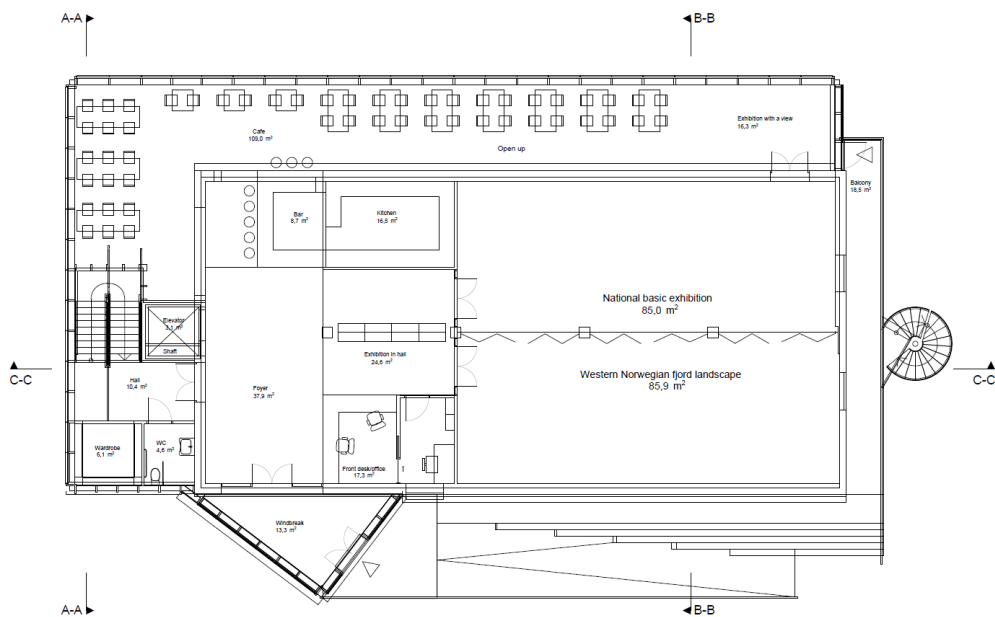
Drawing of floor 1 of the concept from MAD architects. [3]
